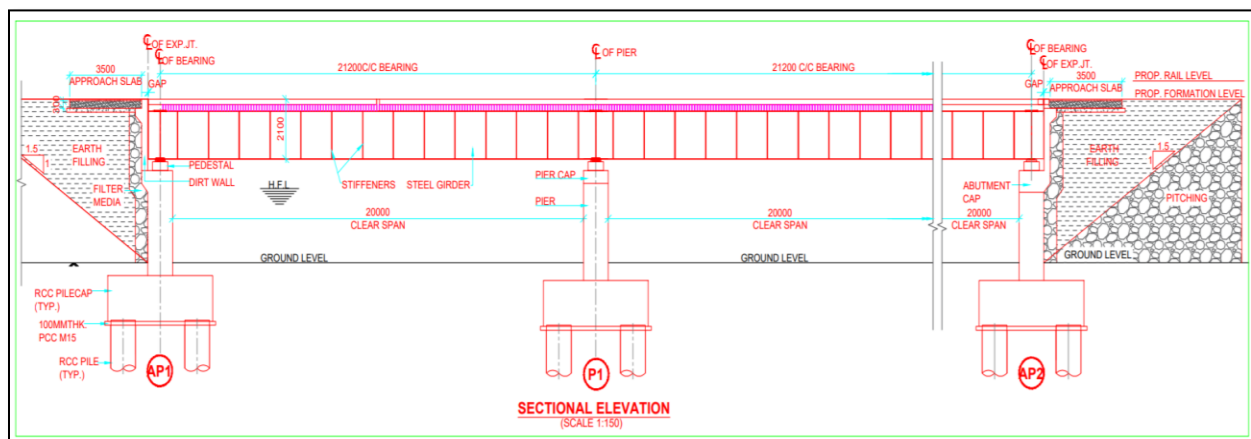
Typical GAD of 1 X 20 m Steel Girder for Important Bridges
